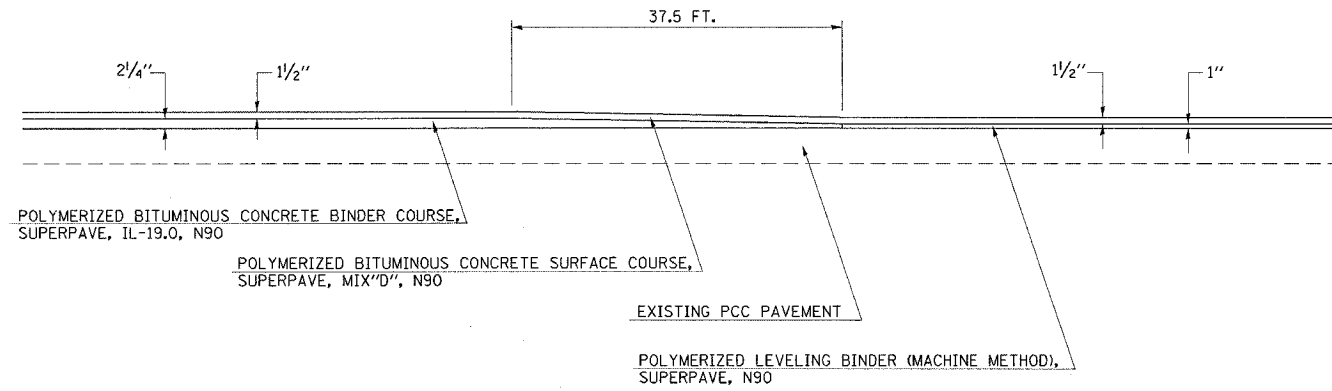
DETAIL OF PORTLAND CEMENT CONCRETE REMOVAL - BUTT JOINT
